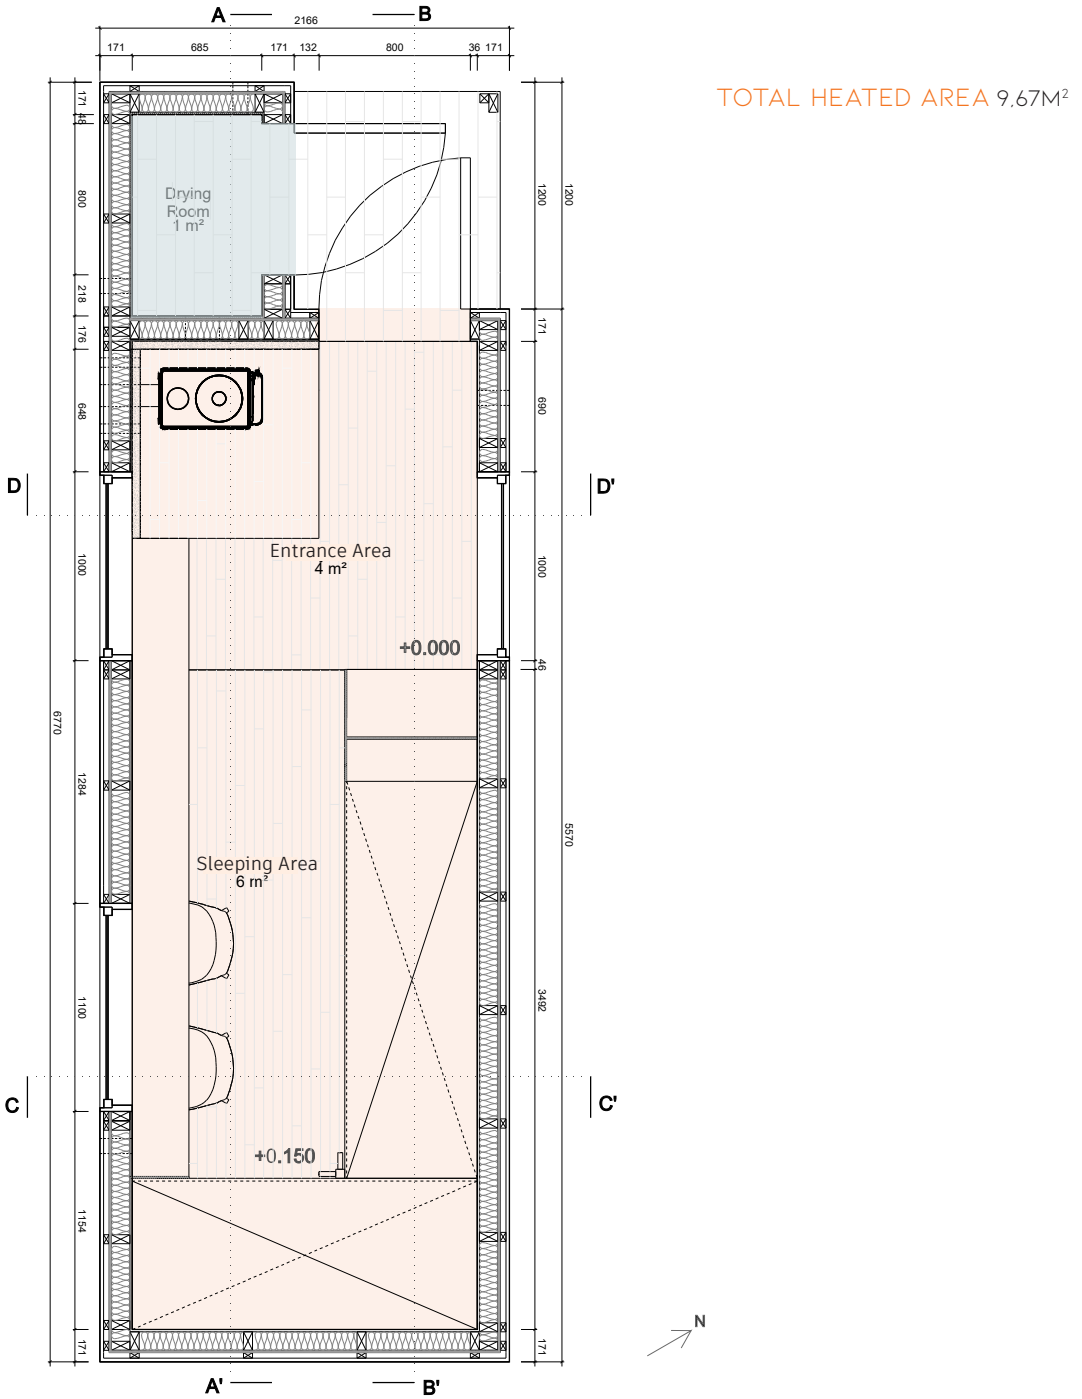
PLAN OF THE BUILT CABIN. SCALE 1:40
